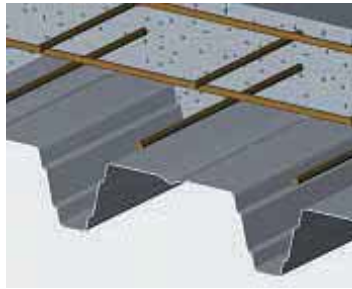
Cofrasolfloor (Floor systems guide,ARVAL,2013)
